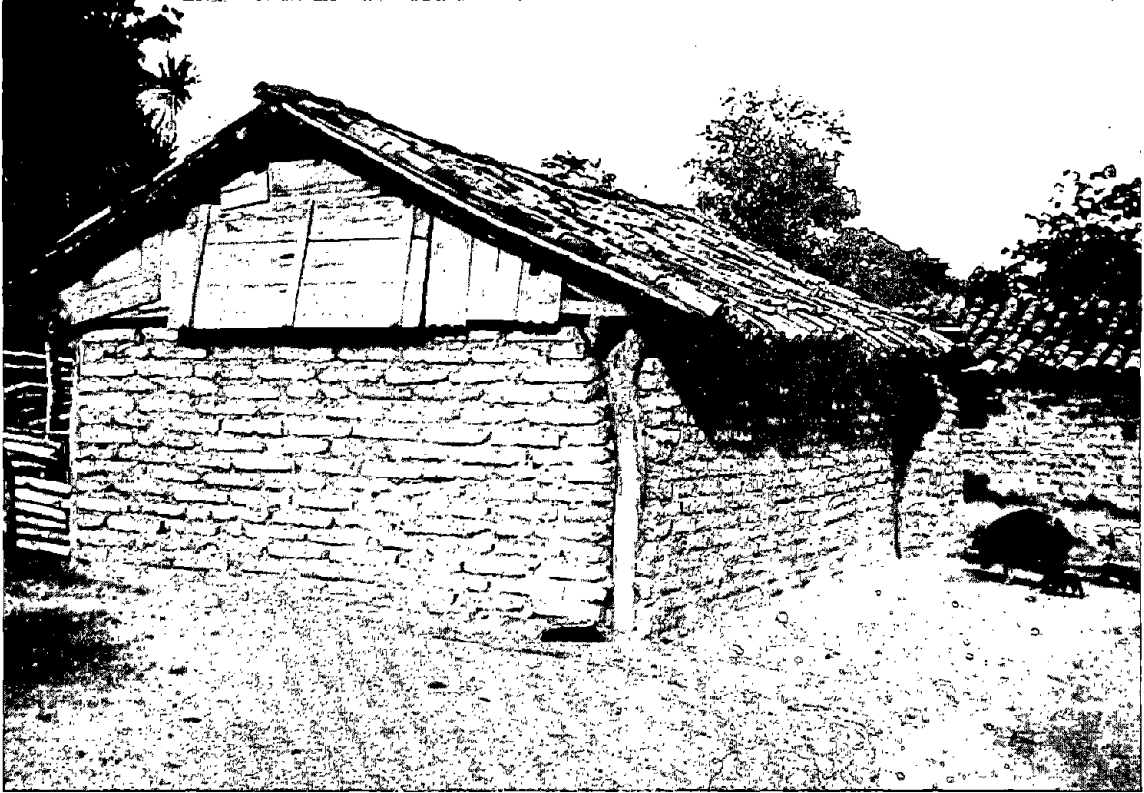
Adobe DeCanto Walls with Tile Over Lamina Roof.
